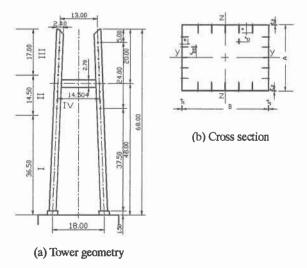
Steel tower of Iwamizawa cable-stayed bridge
